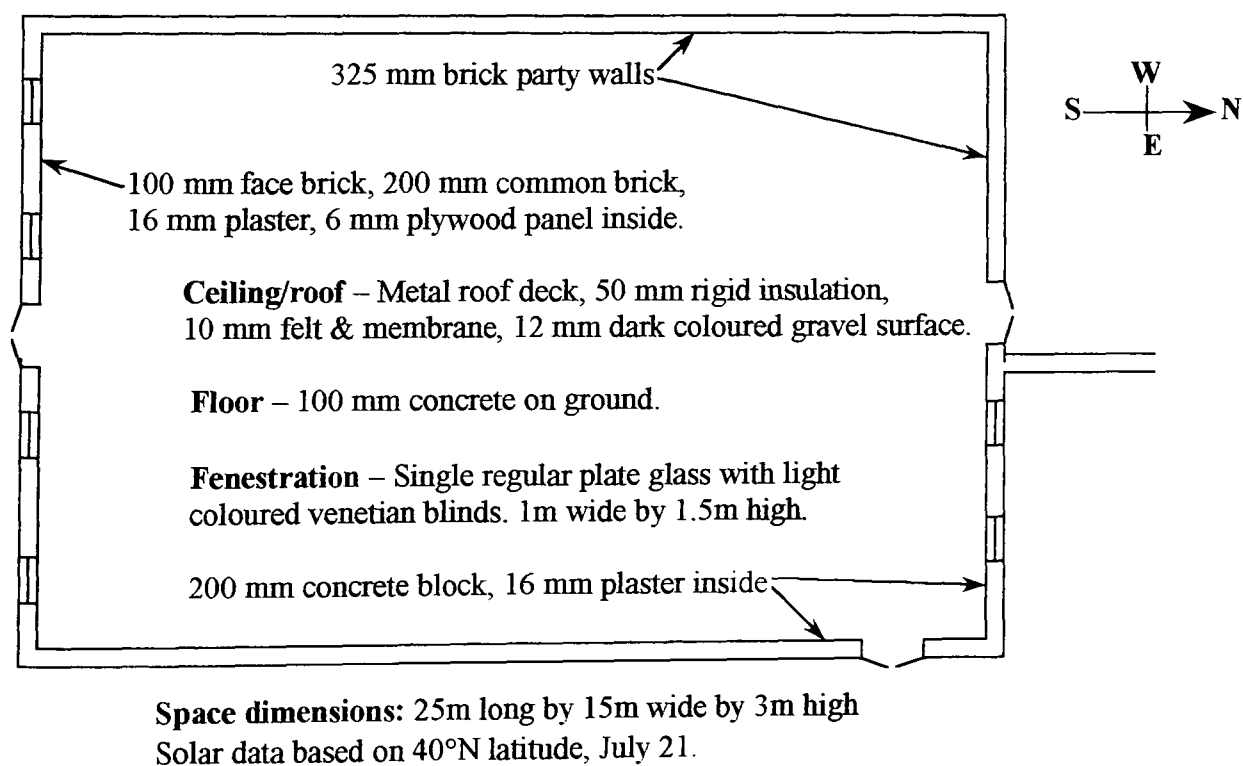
Plan of building, example 6, ASHRAE Fundamental Handbook, 1993.
